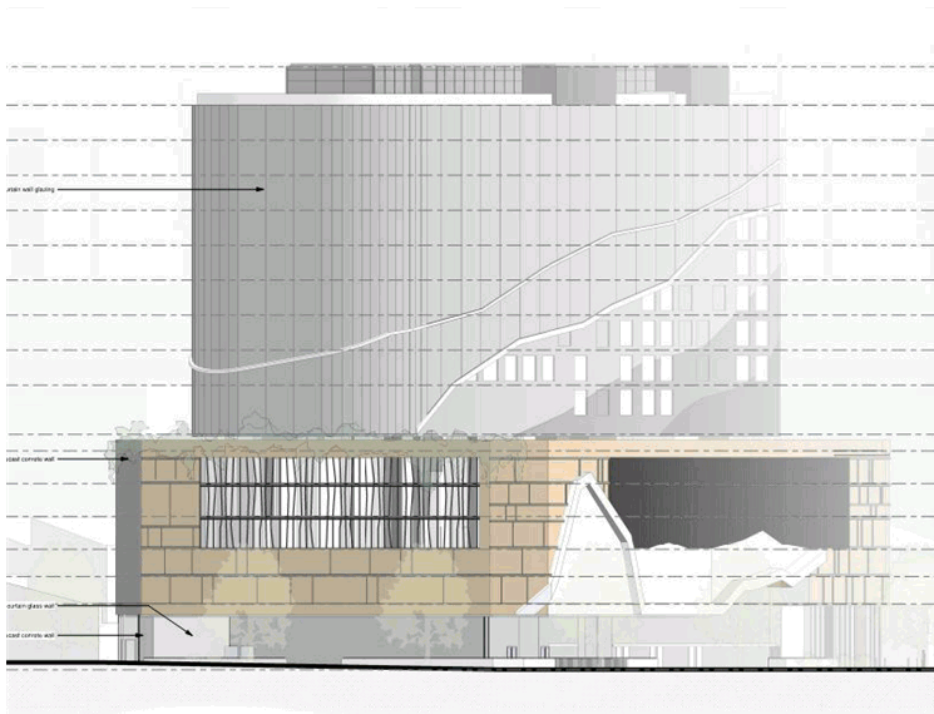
Brooker Avenue Elevation (Excerpt from proposal plans).
